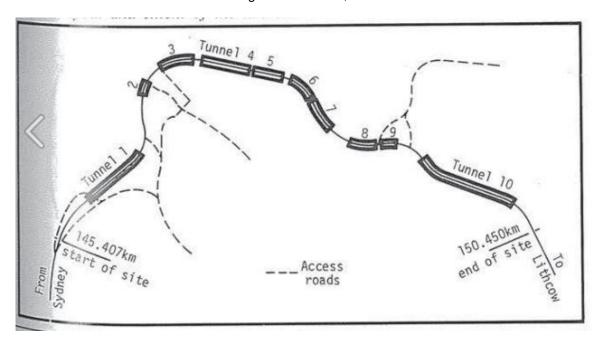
Map showing route of Great Zig Zag Railway deviation tunnels, 1980 (Source: Duncan, S.D. 'Paved track for Australia's Blue Mountains Zig Zag tunnels' Tunnels & Tunnelling, May 1980, p31)
